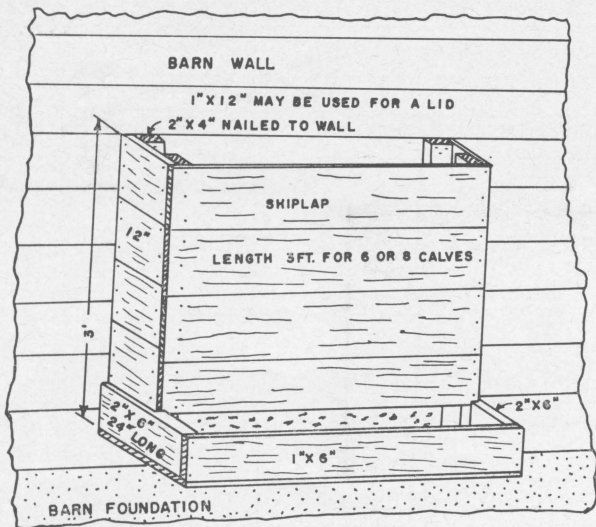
An inexpensive feeder can be built under a shed. (Blueprint No. 172)
